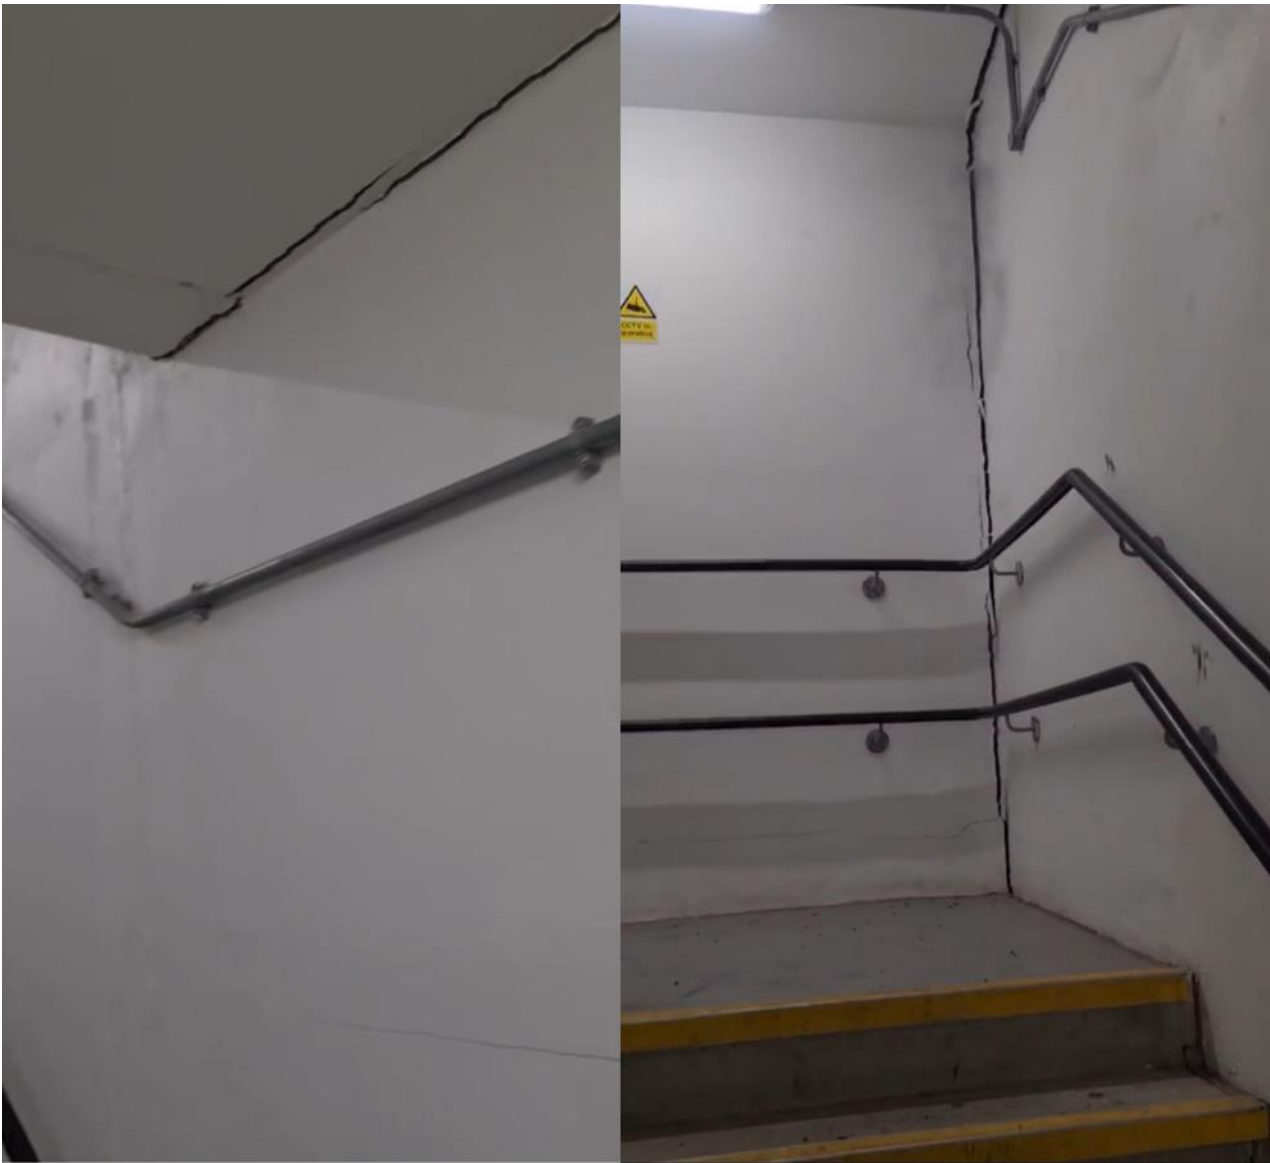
Signs of structural damage in the Northwest Stairwell
